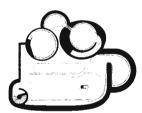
"Vaulted" walls – as a loadbearing structure with an active form – to resist earth pressure Jørn Utzon: museum project, Silkeborg (DK), 1963
